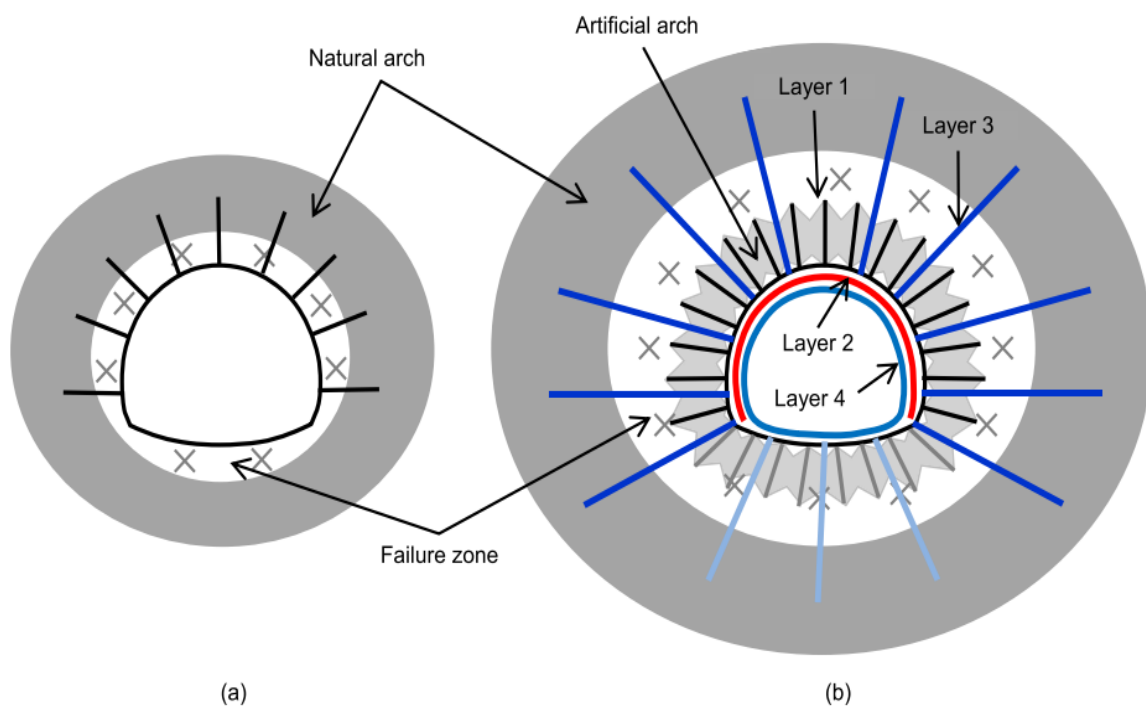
Layered structure of support systems, left: for limited failure zone, right: for large failure zone (Li, 2017)
